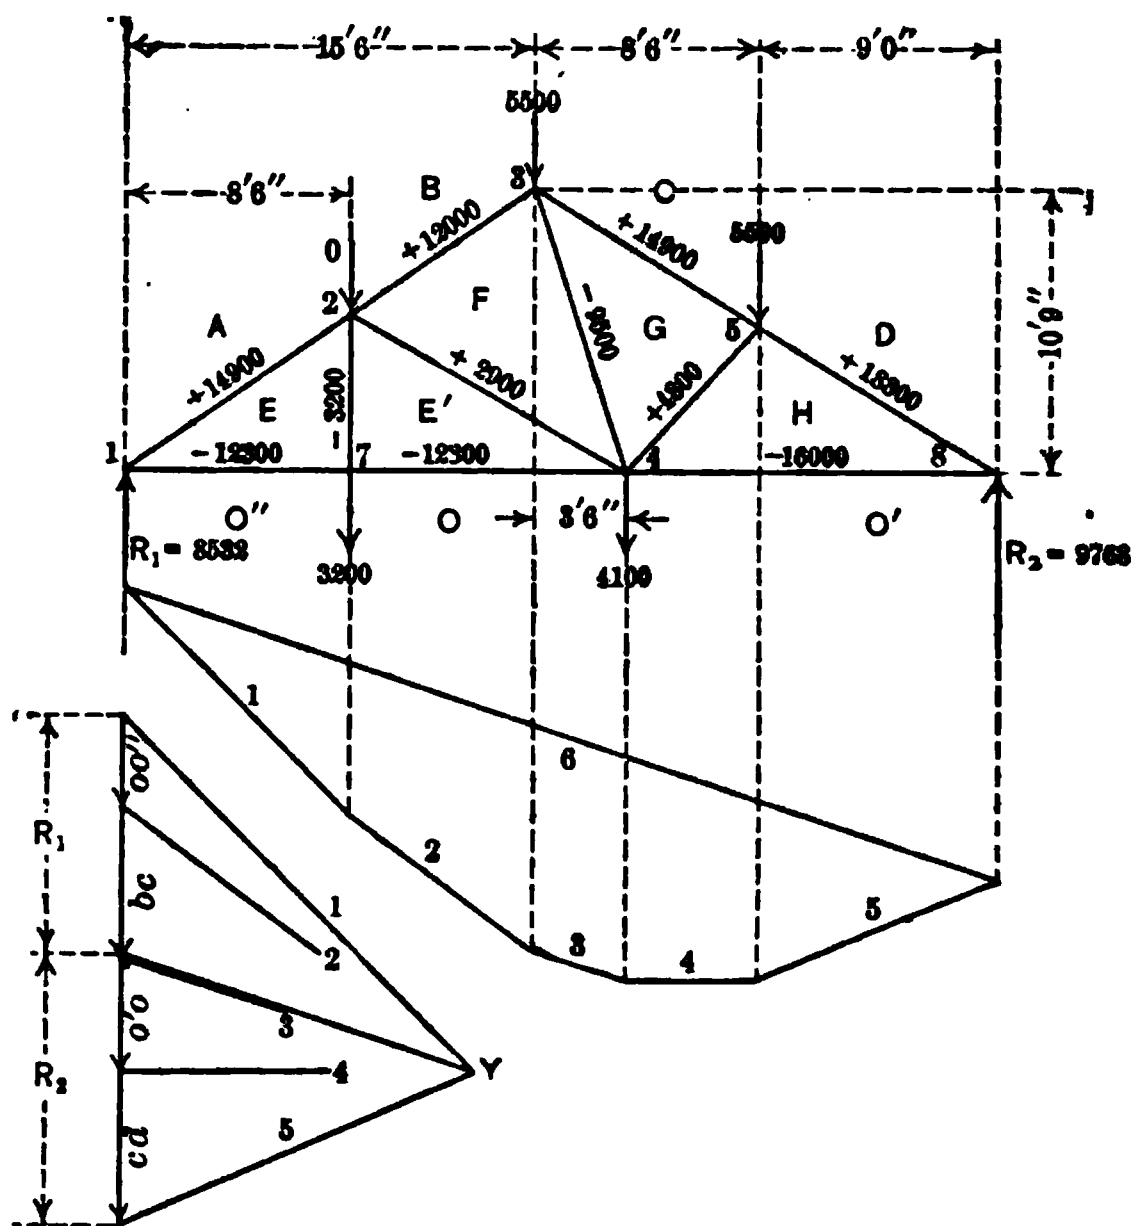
Unsymmetrical Truss. Truss-diagram and Equilibrium-polygon
